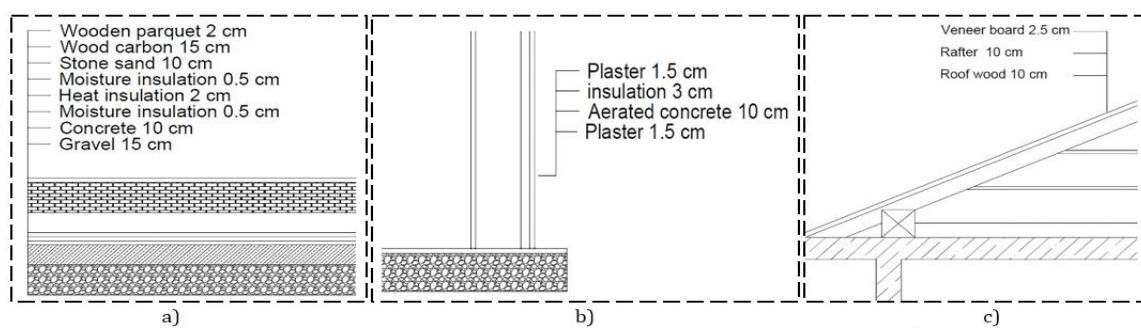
Layering of a) floor, b) wall, and c) roof of the sample building.
